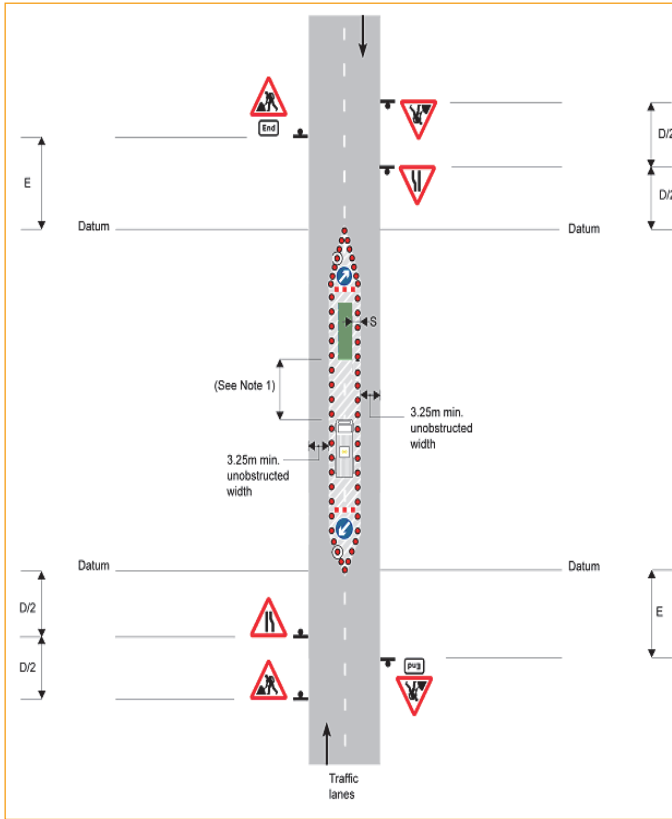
TWO-WAY TRAFFIC ON A SINGLE CARRIAGEWAY ROAD, WORKS IN THE CENTRE OF THE ROAD (LHS)
